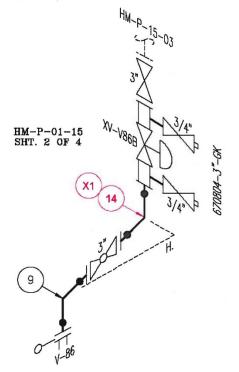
A partial view of isometric drawing HM-P-01-15, sheet 2 of 4. The location of profile radiography (X1) is shown in red.
